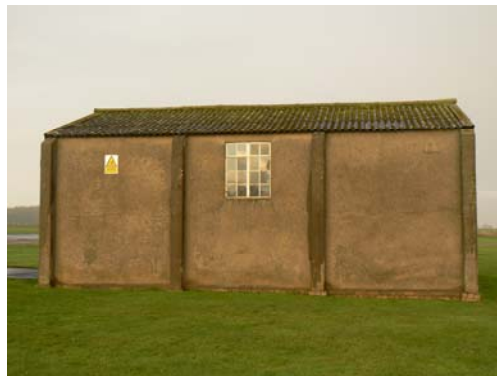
The Crash Tender (Building 38), an example of the cement-rendered brick masonry buildings
